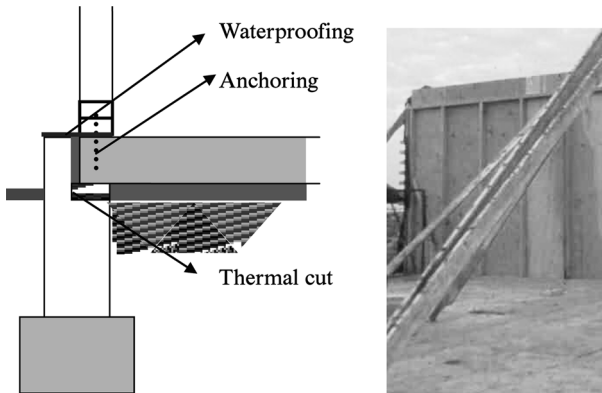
Timber-framed construction, anchoring in the foundation walls.
